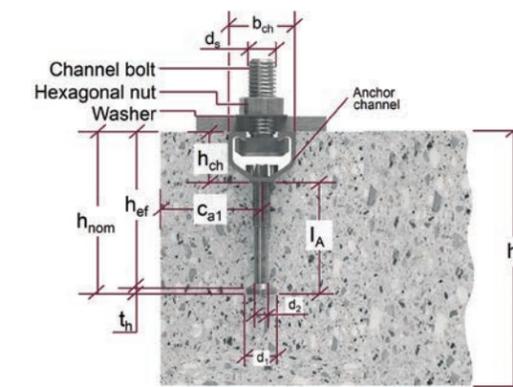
Section view of an anchor channel system in a concrete member.
